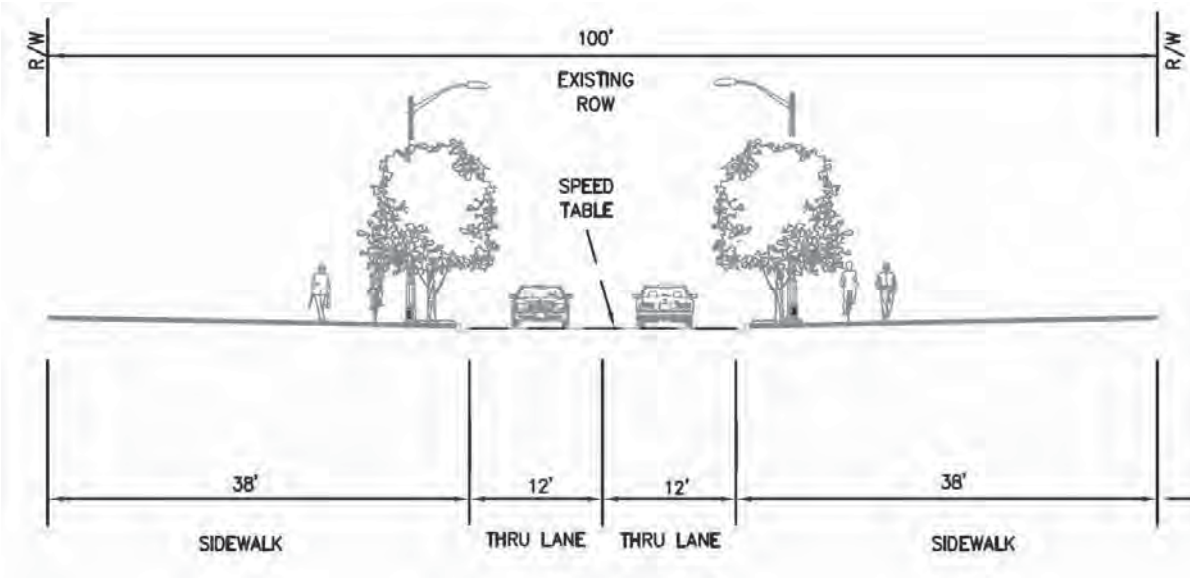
Proposed Cross Section, 3rd Avenue Without Diagonal Parking
